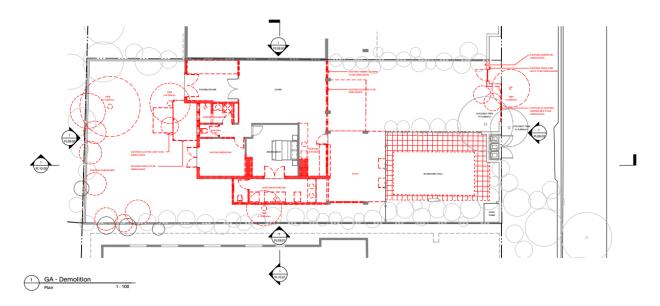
Demolition Plan – Existing Unit 1 (Source: officefora, September 2025)
